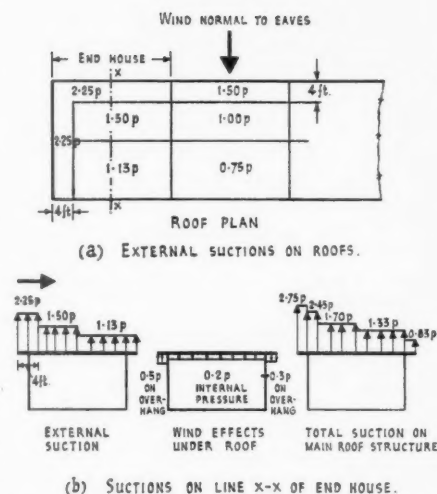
Wind suction for a block of houses with flat roofs of lightweight construction
